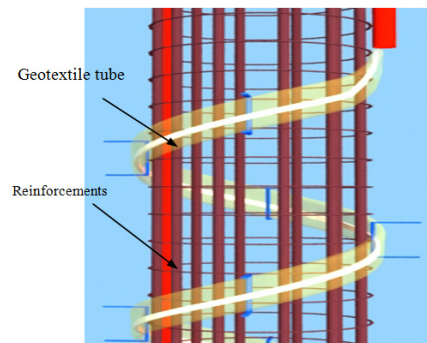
Geotextile tubes around the reinforcements for later construction of helical piles
